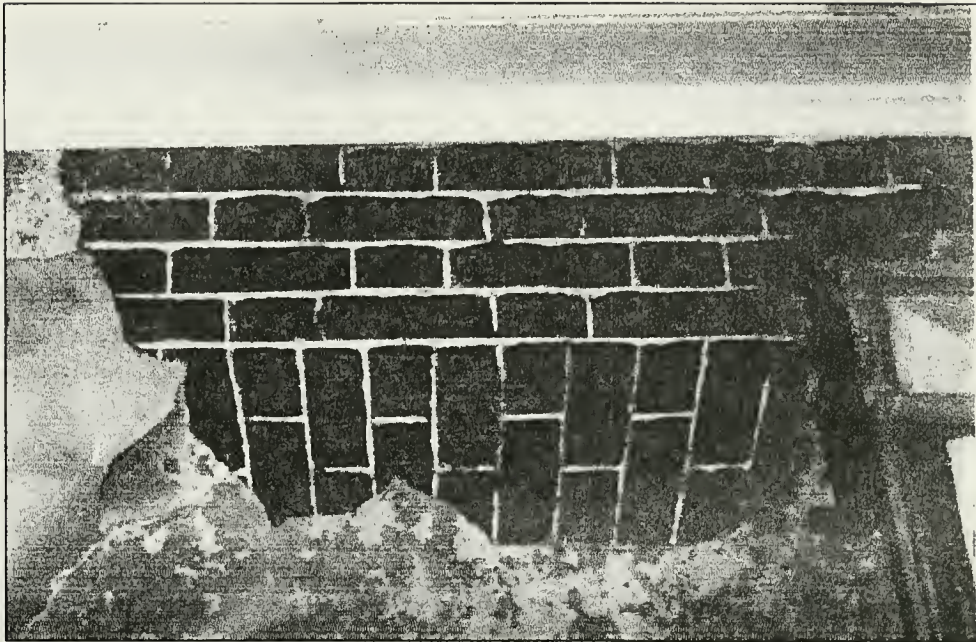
By presenting a uniform material across the breadth of every facade, stucco covered evidence of alterations; shown here, a previously-exposed brick jack arch which once provided structural support above a window. East facade, first floor piazza.
